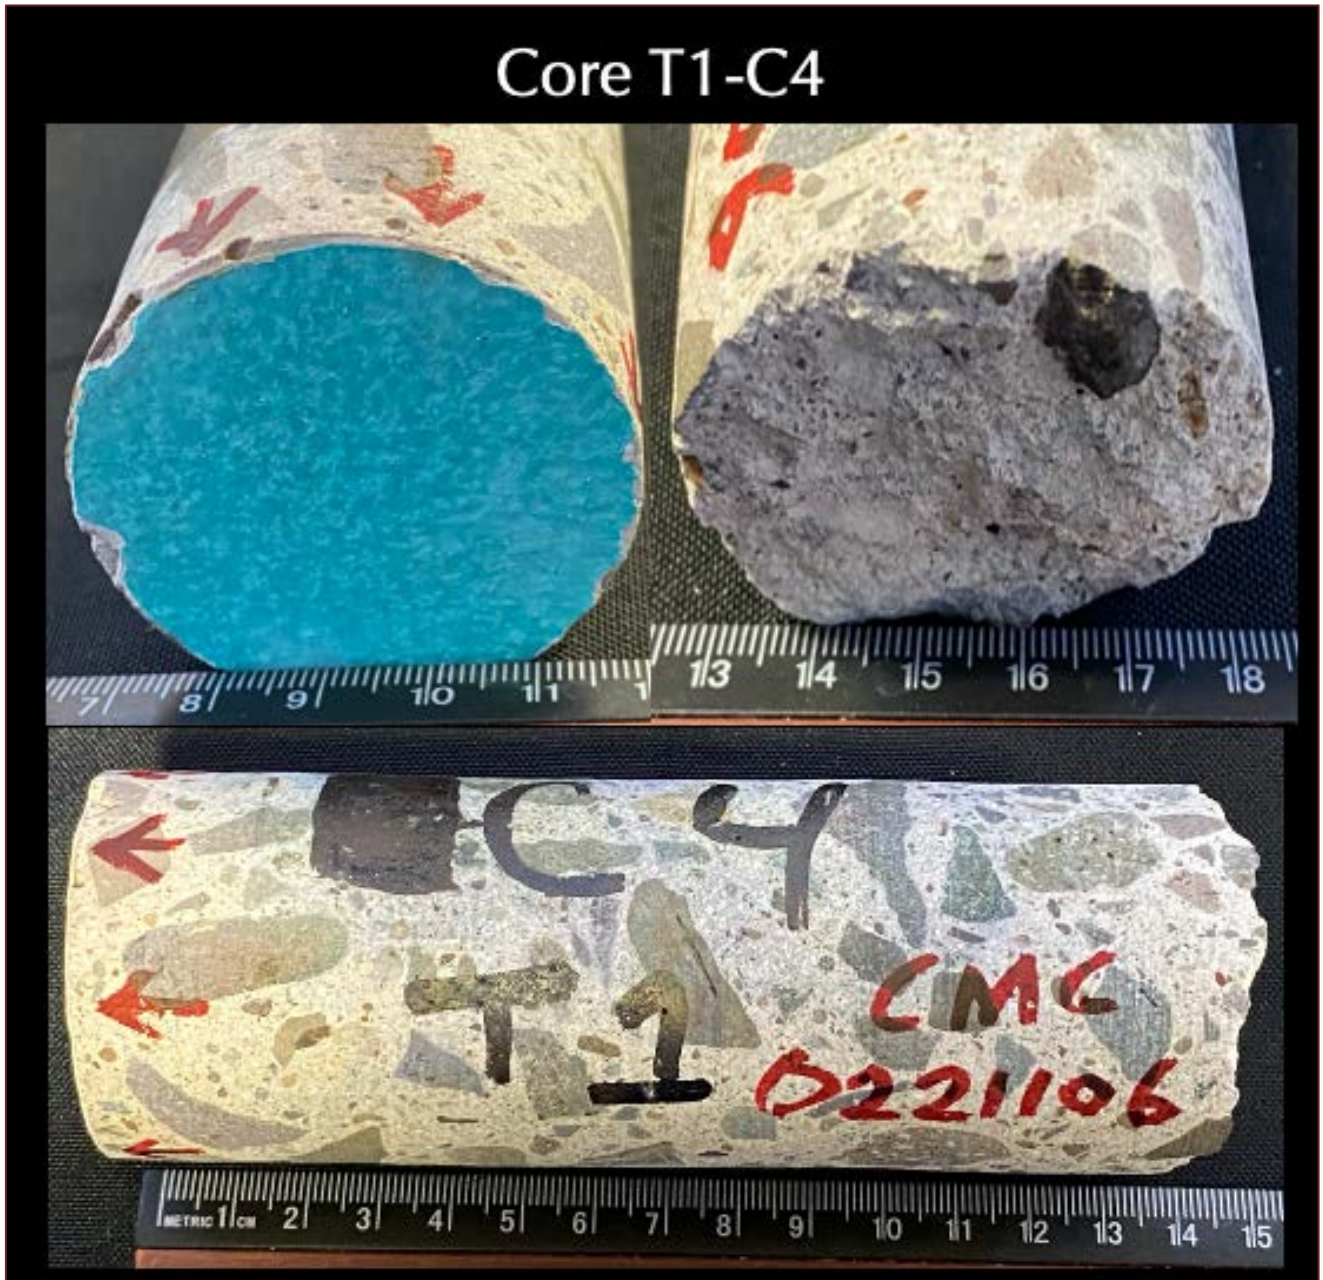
Shown are the exterior painted surface (top left), interior fractured end (top right) and side cylindrical surfaces of the Core T1-C4 from Anaerobic Tank 1.
